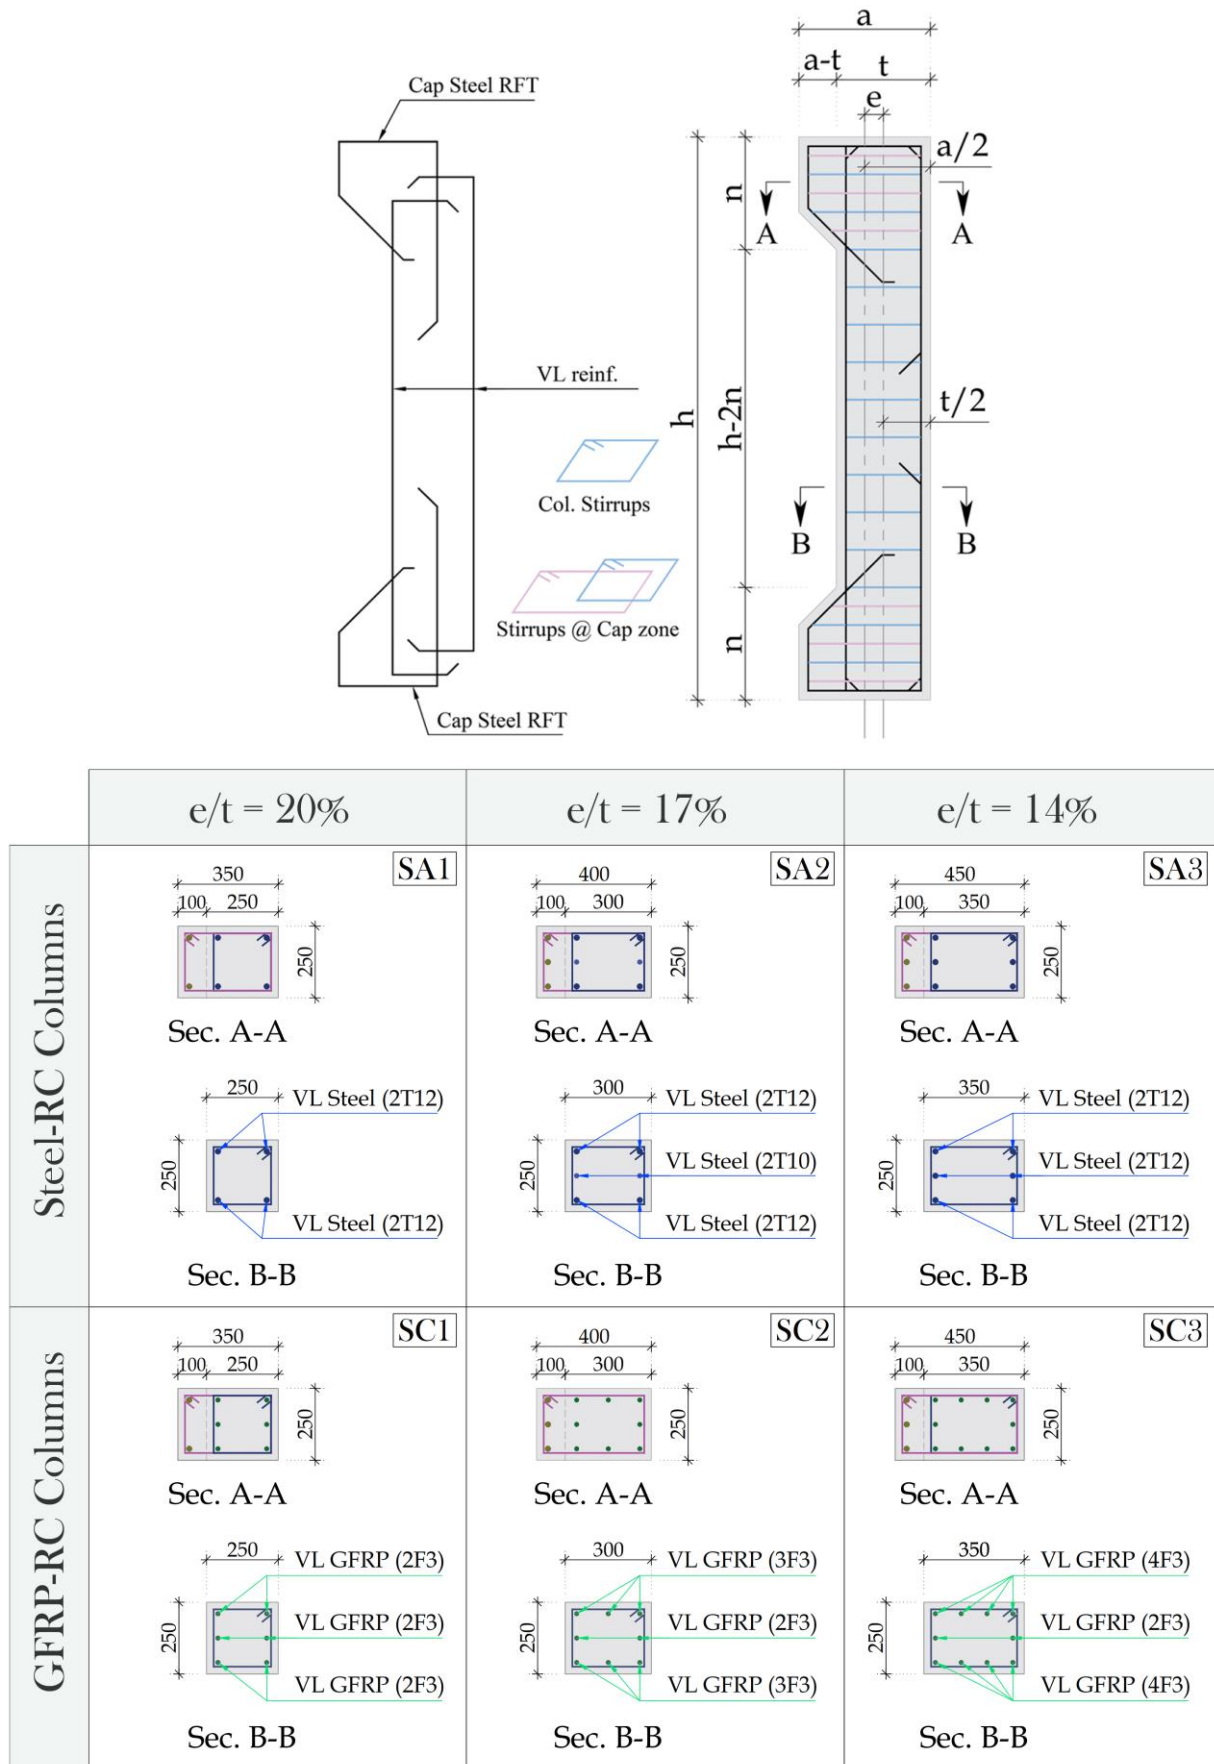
Dimensions and reinforcement details of the RC columns (dimensions are in mm)
